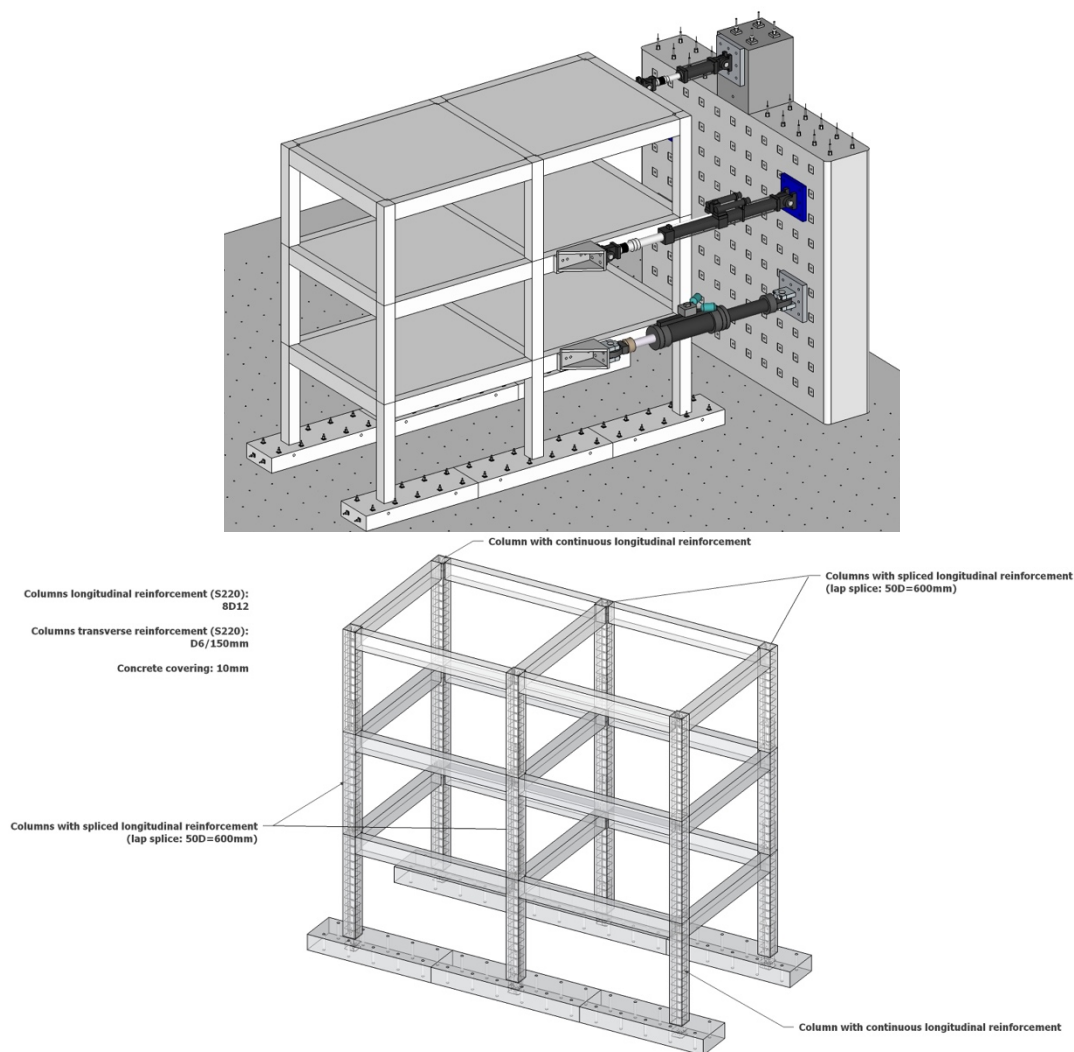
The ARISTA structure: schematic (top) and reinforcement layout (bottom)
